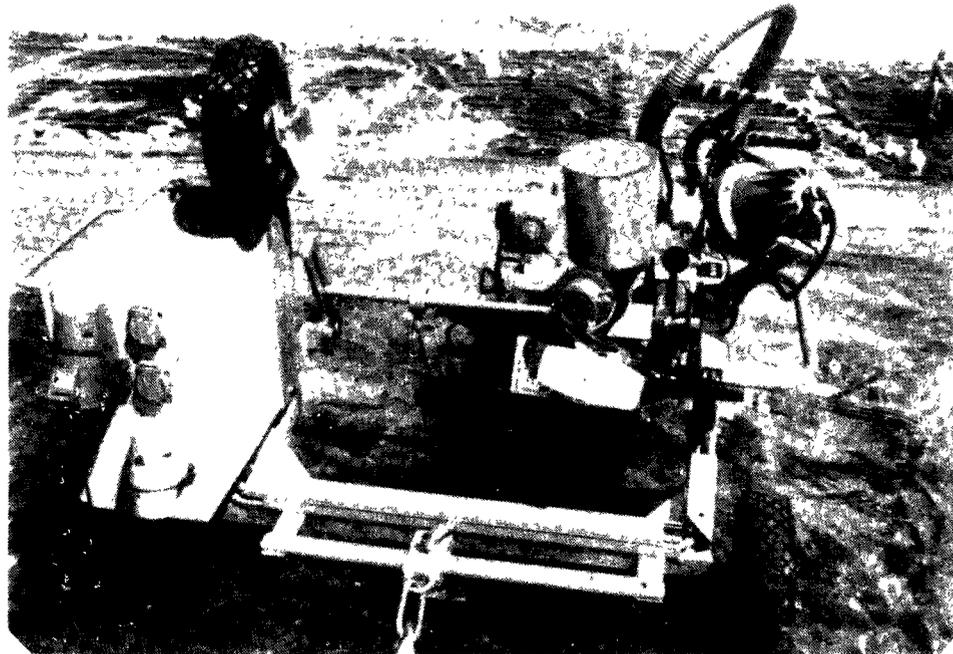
A partially-automated extrusion welder for seaming HDPE FMLs. Molten HDPE is extruded between the overlap of the two sheets being seamed. The welder is shown being lowered down a side slope by a winch.
